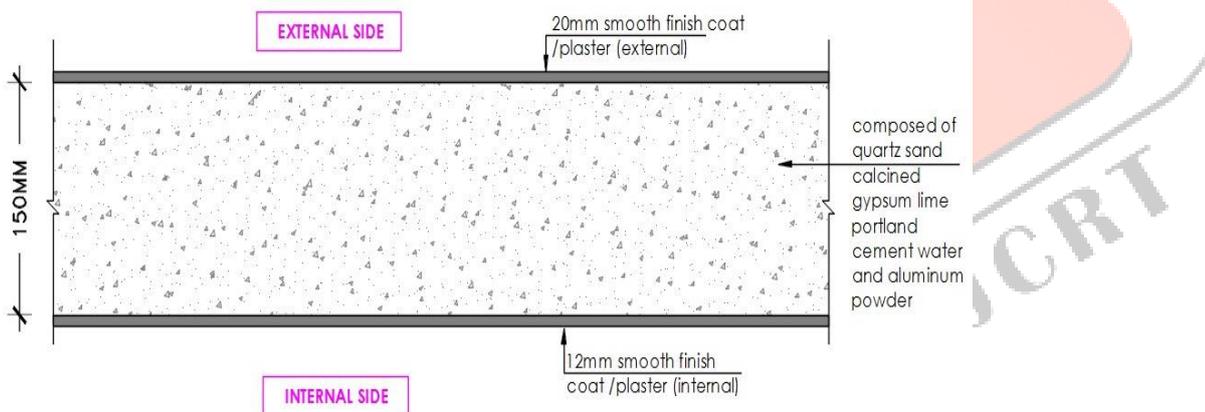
Detailed wall Section for AAC Block (150mm thk.)
